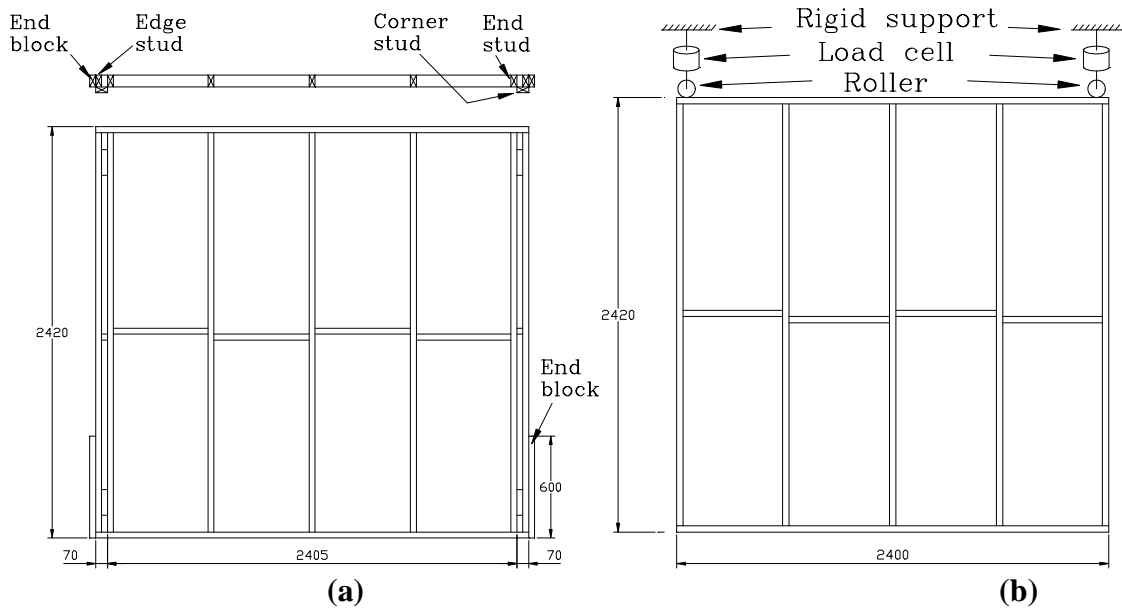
Configurations of (a) Walls 2 and (b) Wall 3.
